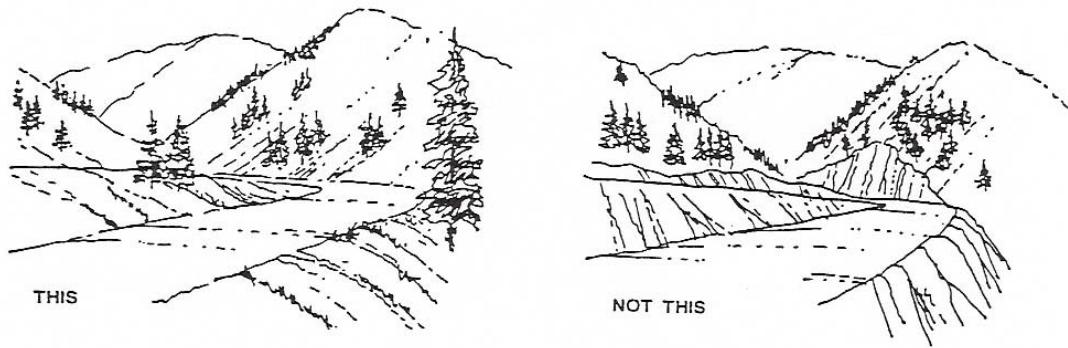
Driveway design should minimize the need for cuts and fills.
